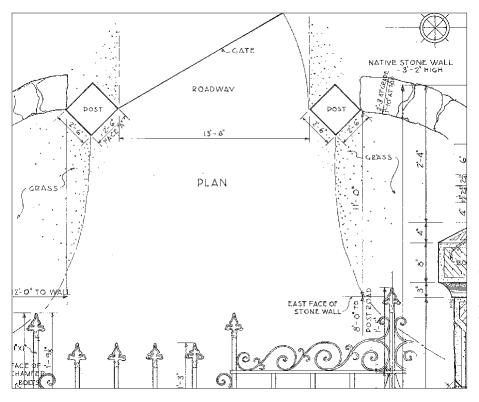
Plan of the Home Road entrance gate and head of the Home Road as drawn by the Public Works Administration in July 1941. Note well-defined, curved edge of the Home Road. (Detail, file NY1240, Library of Congress, American Memory Collection.)
